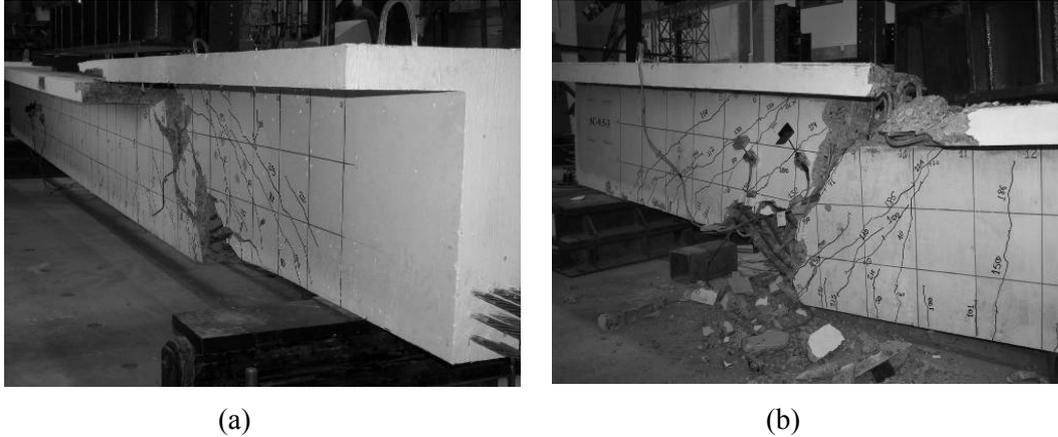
Shear failure of test specimens: a) SC-9.5-2 (d/2); b) SC-9.5-3 (d/3).
